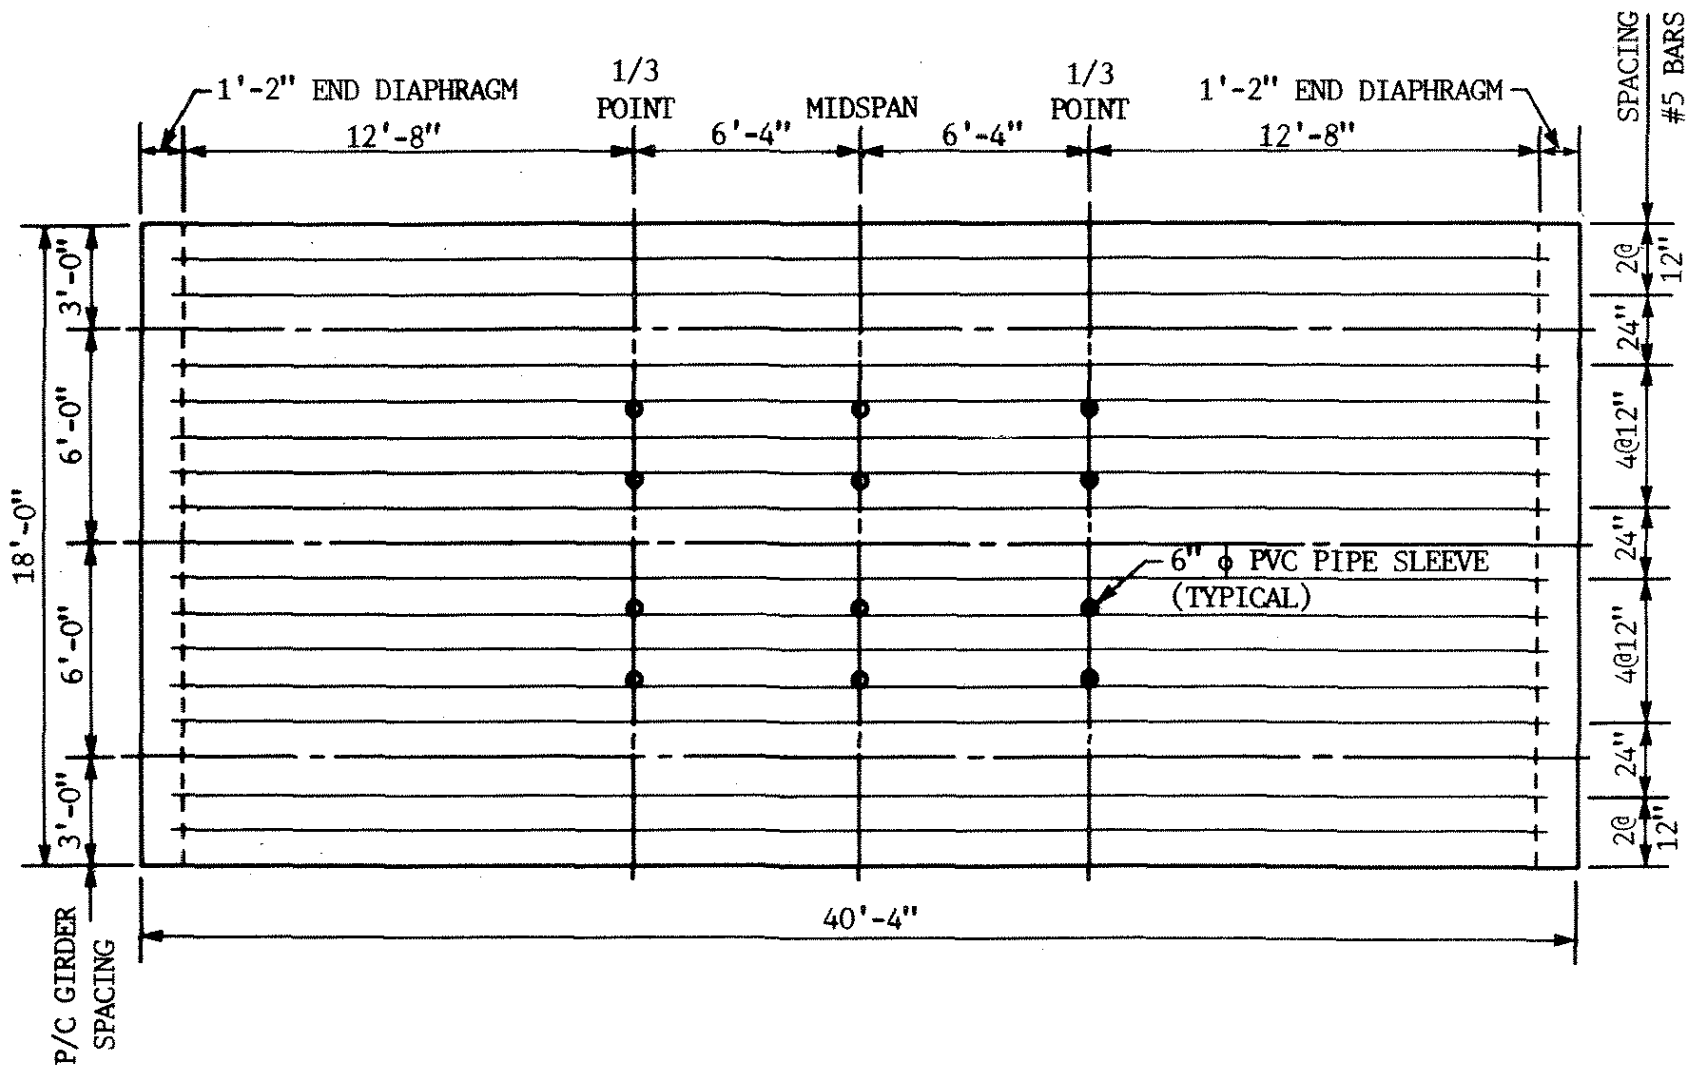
Longitudinal reinforcement in bottom of deck.
